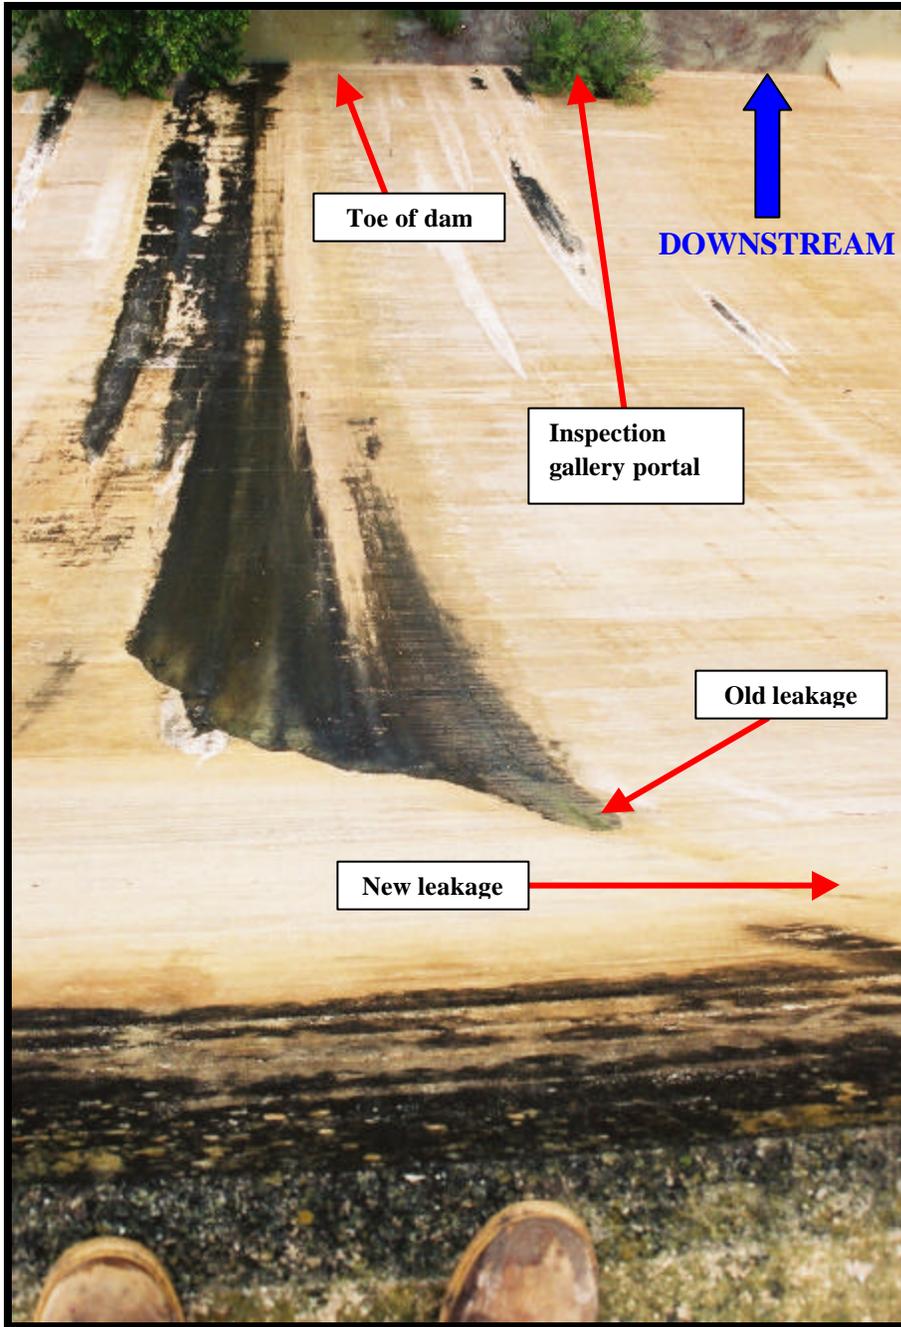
View of vertical crack in concrete gravity section-left abutment, looking right and downstream. Note the new leakage through the crack versus older, algae-stained leakage areas. (Friday, July 5<sup>th</sup>)
